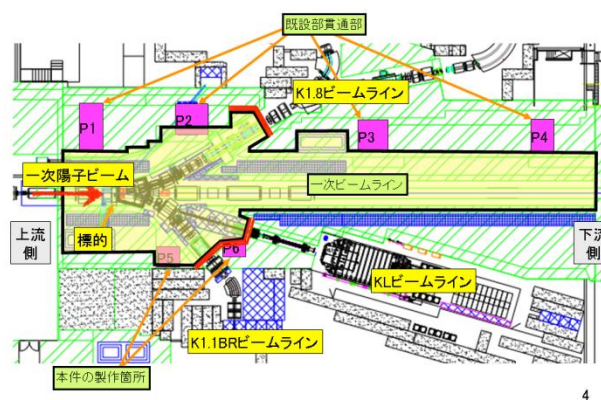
The floor plan of J-PARC Hadron experimental Hall.
